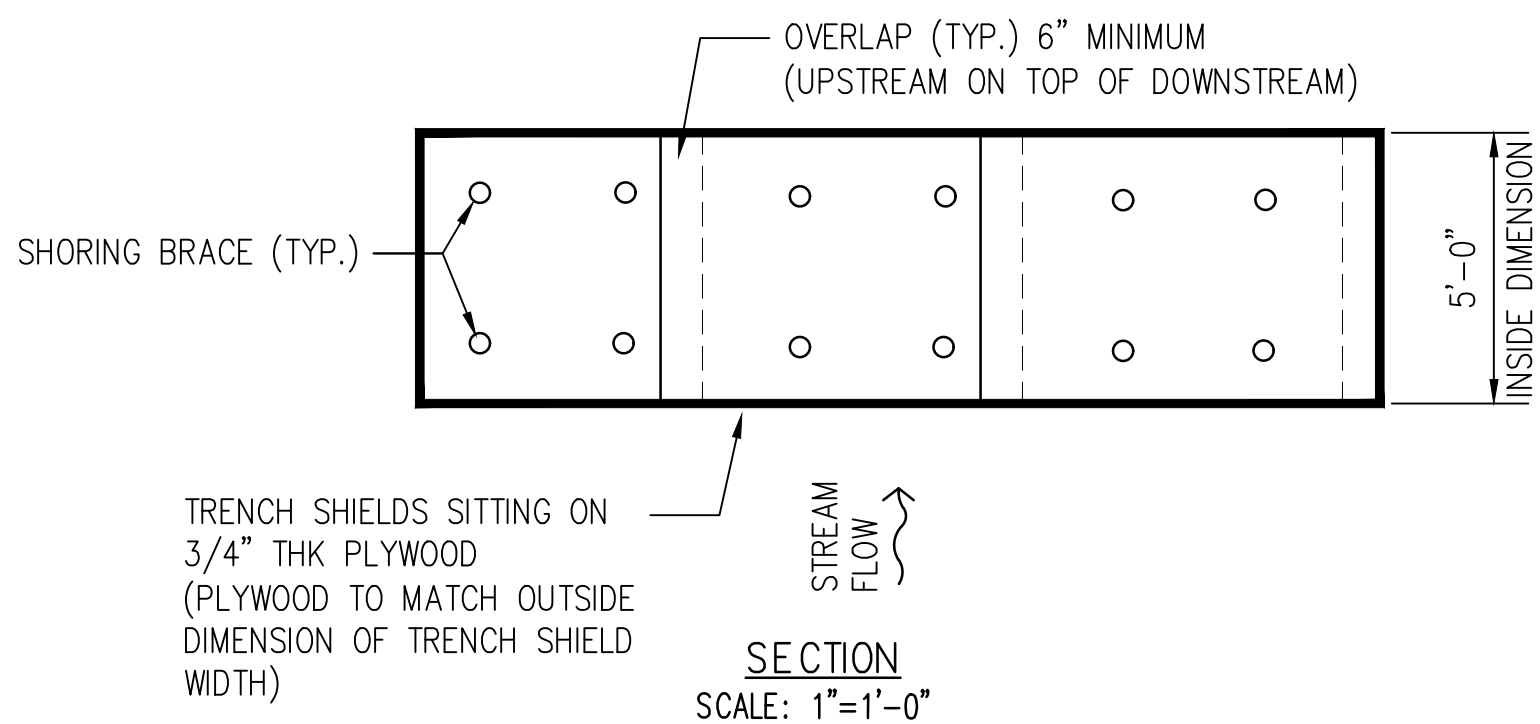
SECTIONS OF THE DIVERSION DITCH
